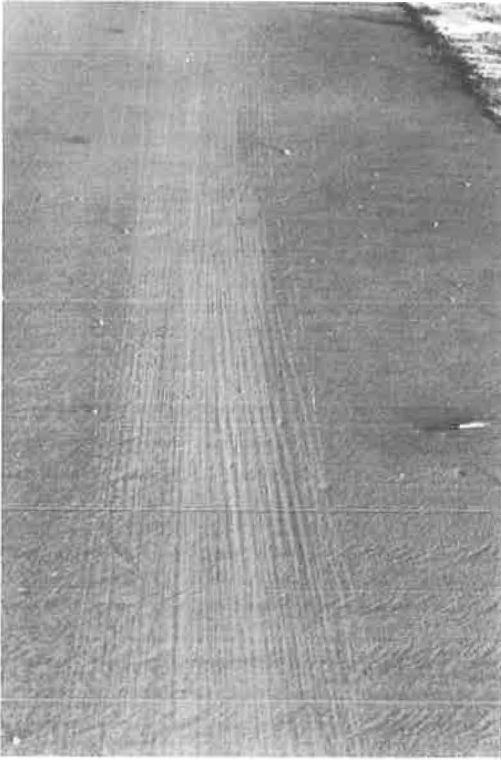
Special test no. 1 on portland cement concrete; pavement surface after completion of tests.
